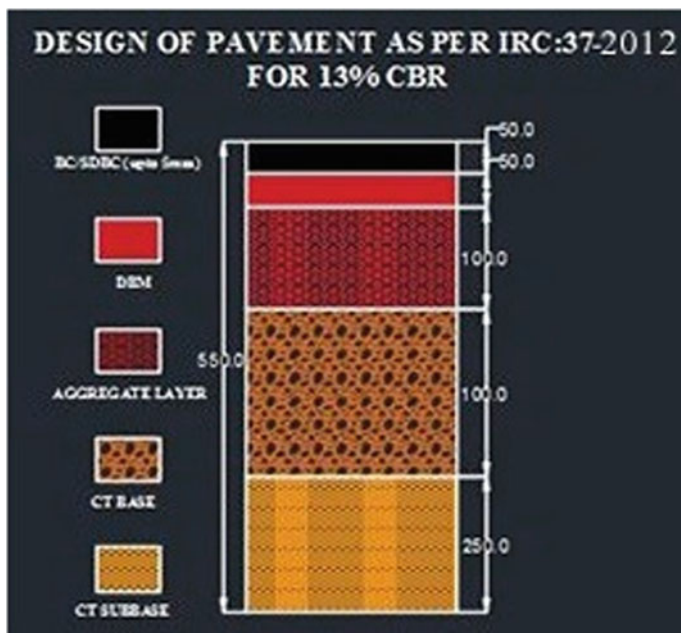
Design of pavement Cross-section 3 as per IRC:37-2012 for 13% CBR in mm
